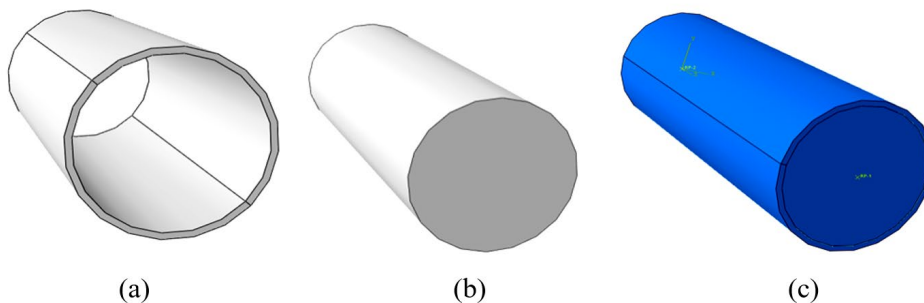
Schematization: (a) steel tube, (b) concrete core, and (c) complete model.
